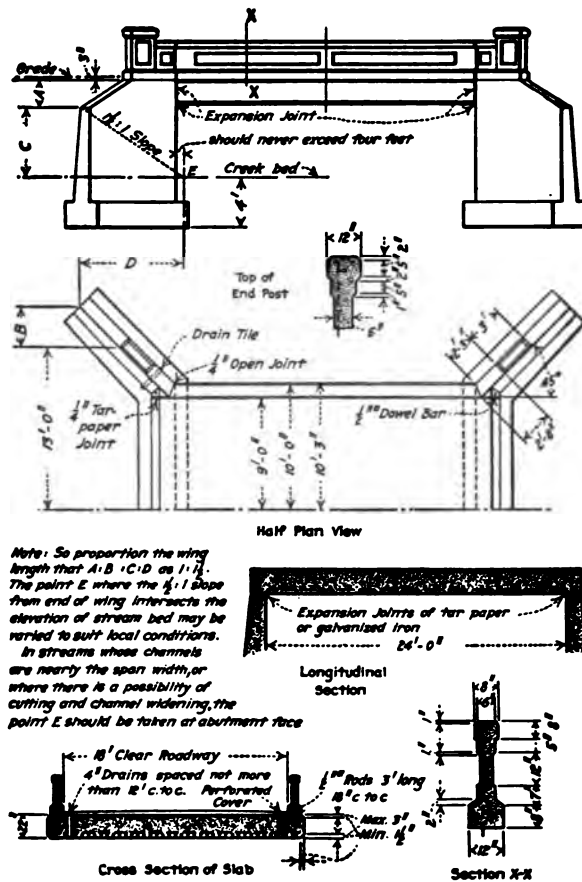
Typical slab superstructure, Iowa Highway Commission.
